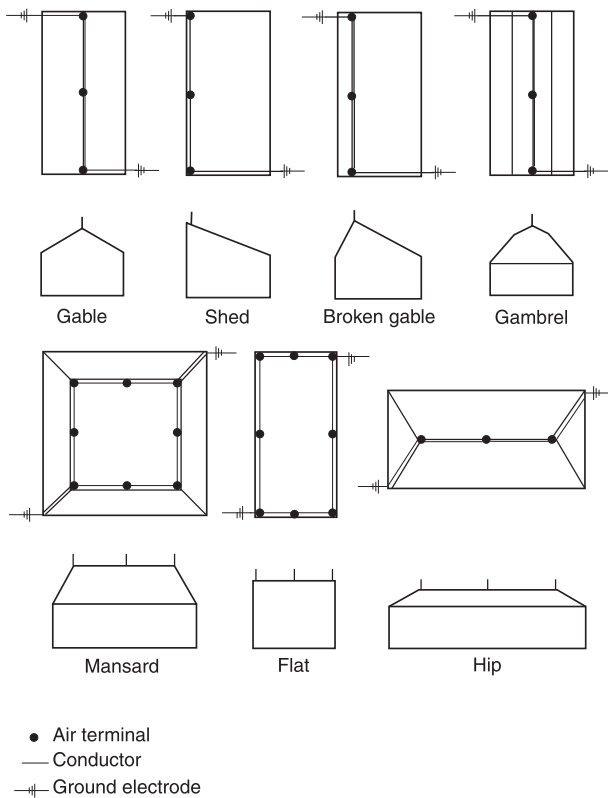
Protection Measures for Various Roof Types. (Drawings are top and end views of each roof type.)
